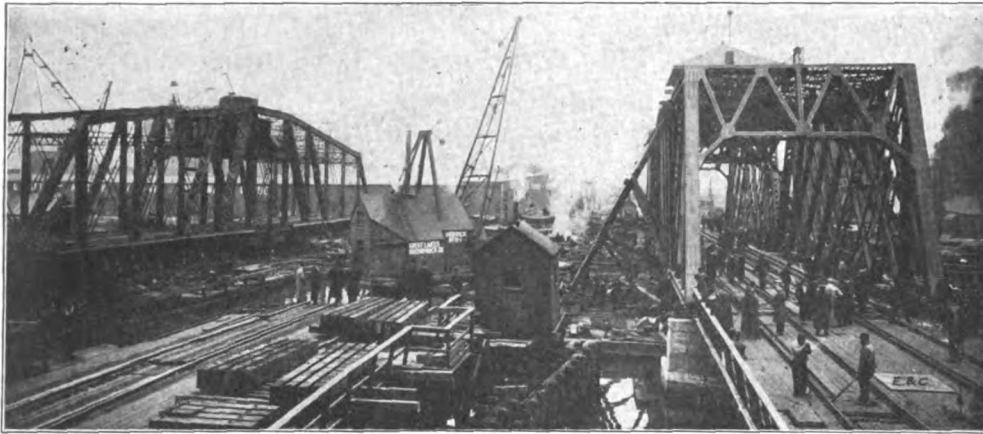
View Showing New Swing Span in Final Position on Reconstructed Piers—View Also Shows Old Span and Part of Temporary Diversion Track—C. & N. W. Bridge, Milwaukee, Wis.
